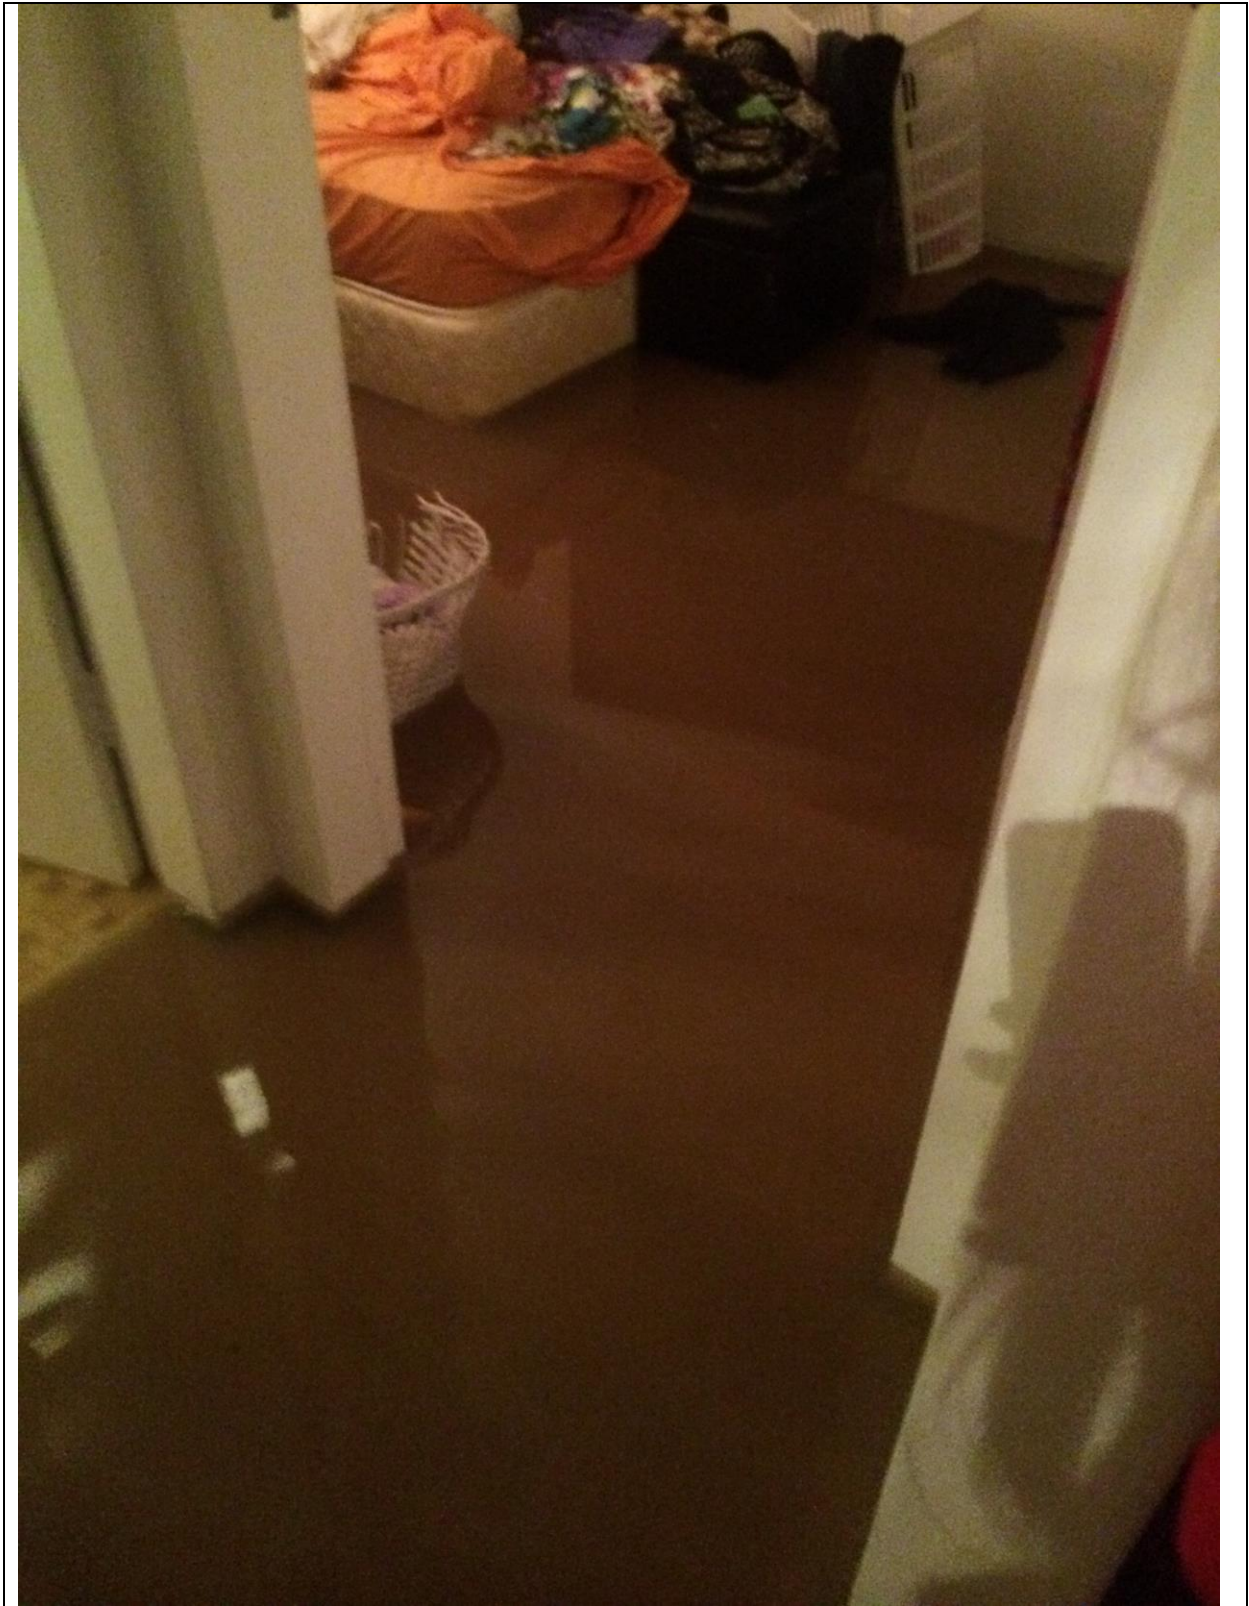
Above-floor flooding in ground floor unit at No. 66-68 Putland Street, St Marys
